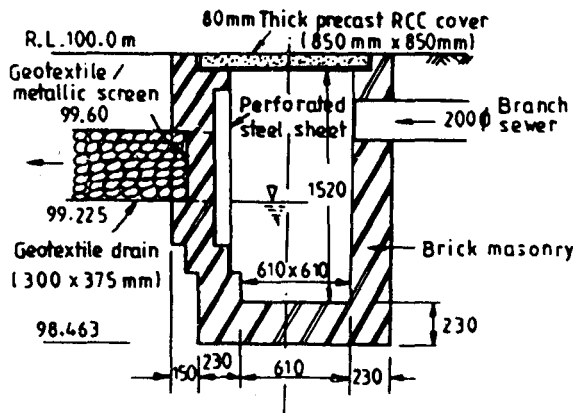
Details of manhole (after Venkatappa Rao, Gupta and Pradhan, 1993)
